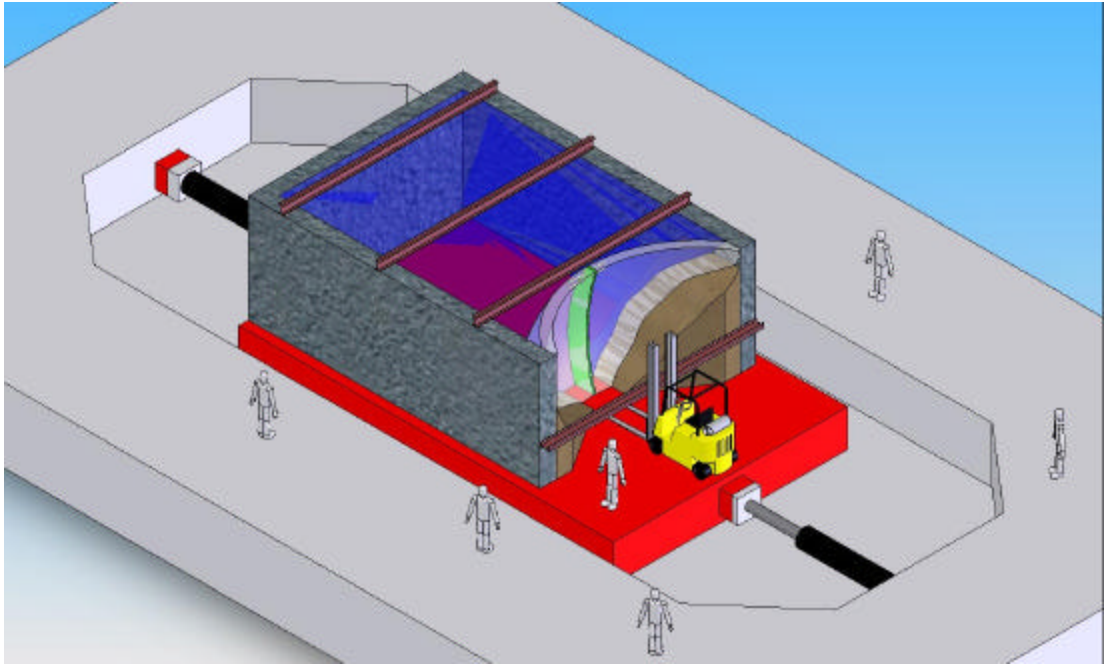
This figure shows a transparent arch dam to better show the shape. At this large scale, contraction joints, lift lines, and “real” concrete can be incorporated.
